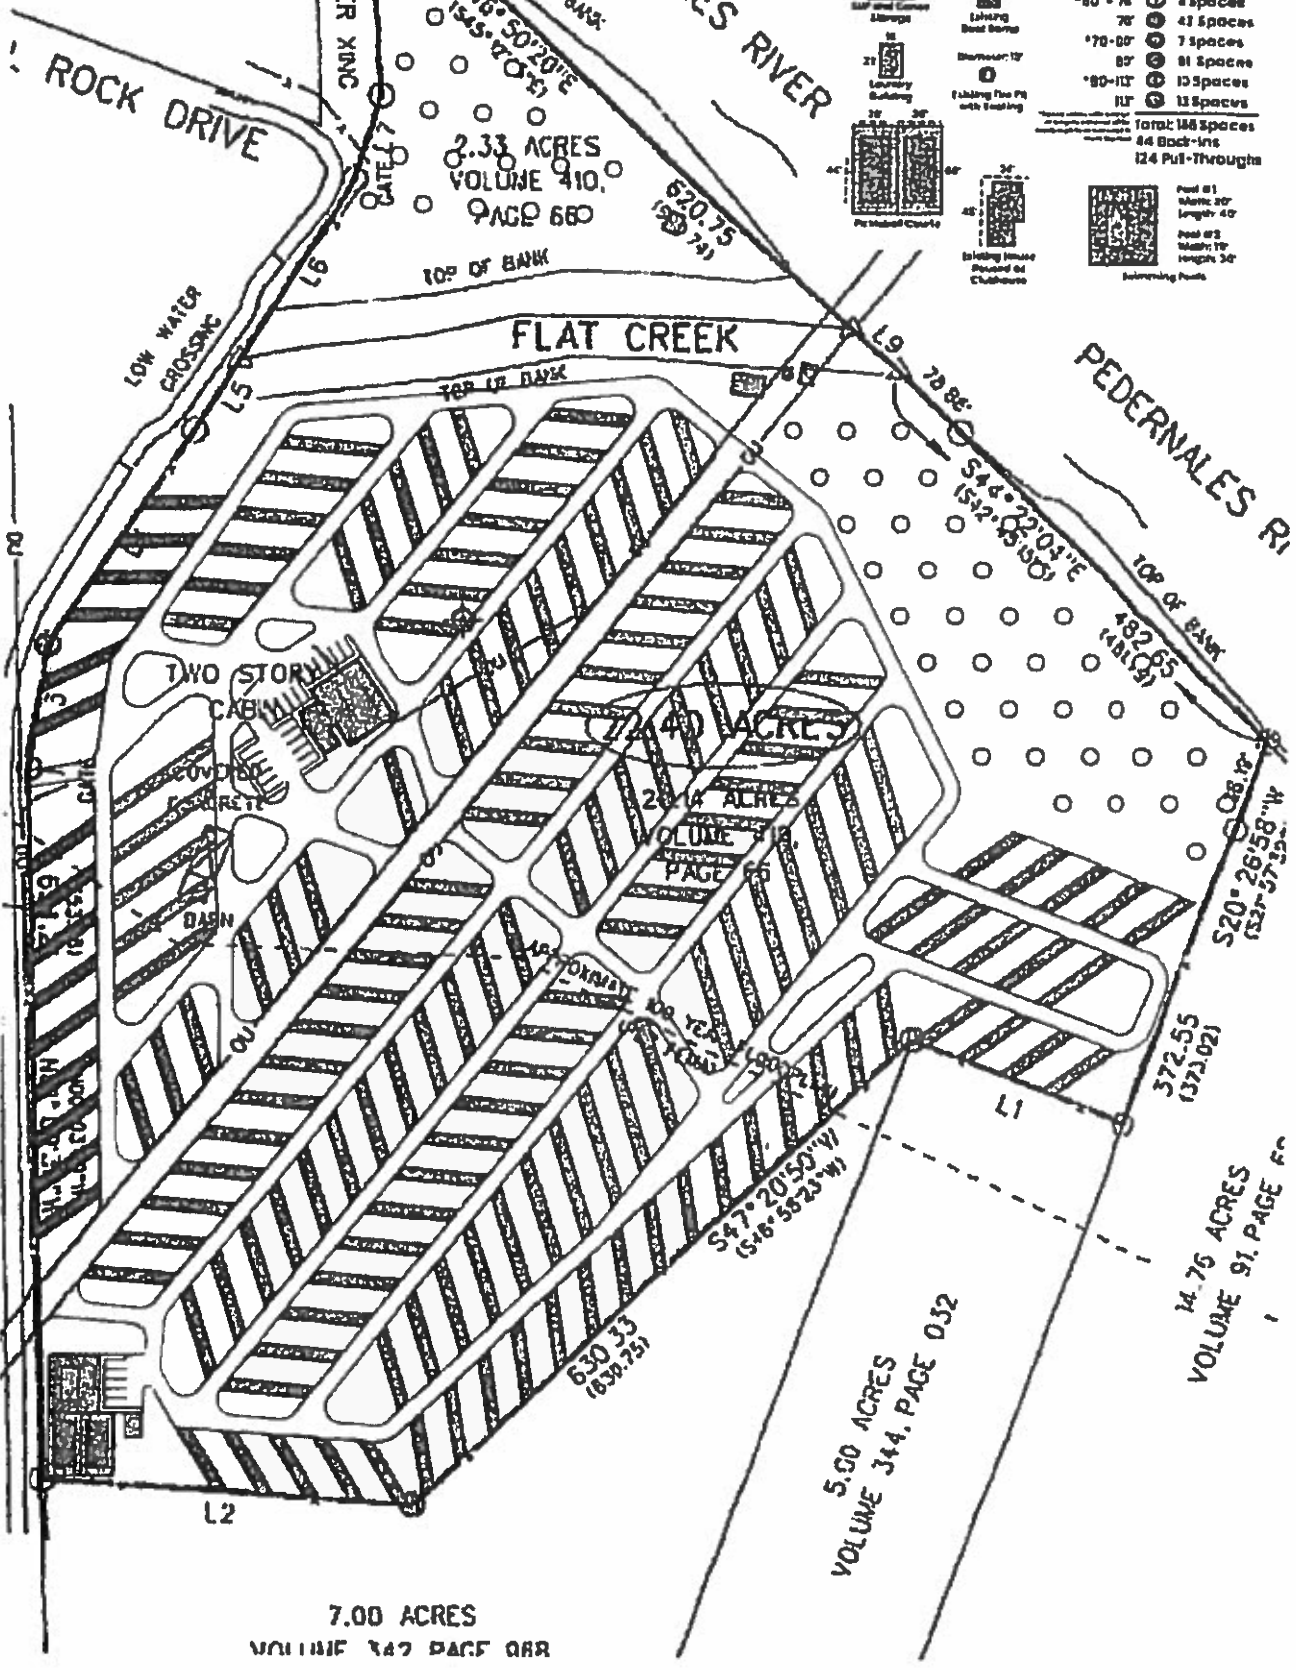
EXHIBIT B: OLD RIVER CROSSING & RIGHT-OF-WAY
